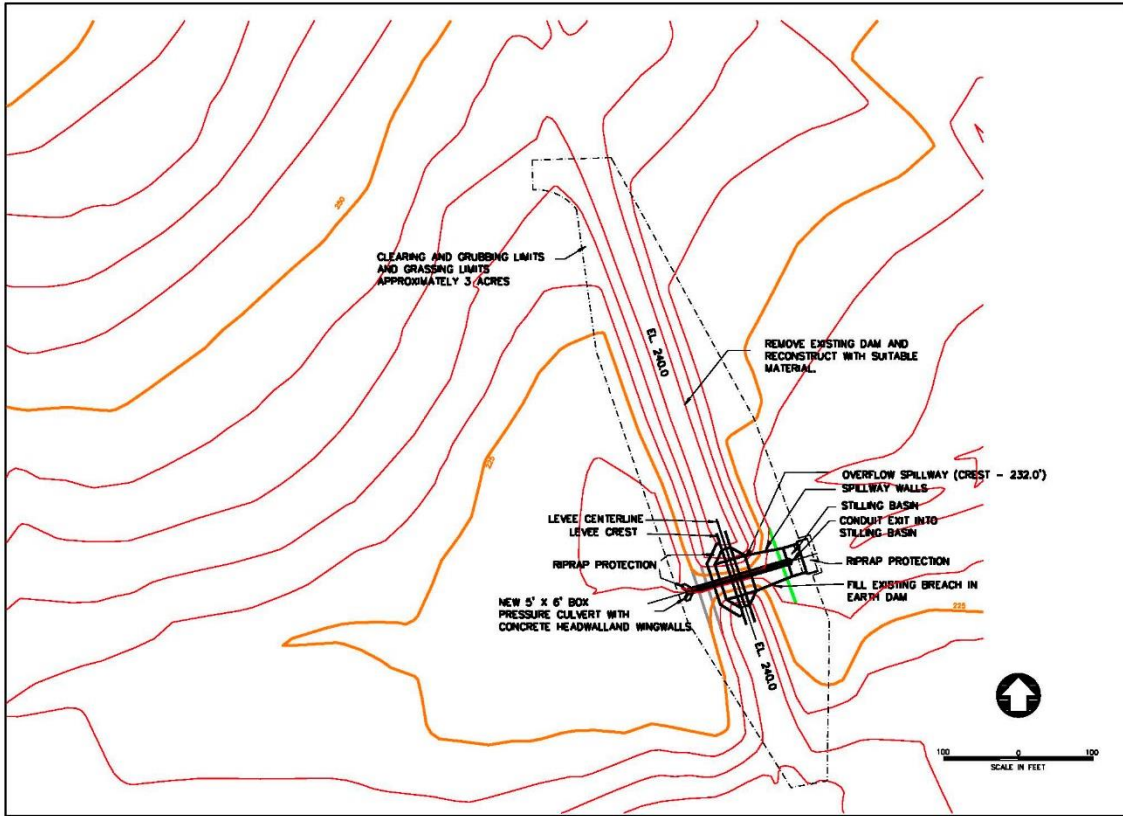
Plan View of the Existing Breached Dam and Proposed Modifications
